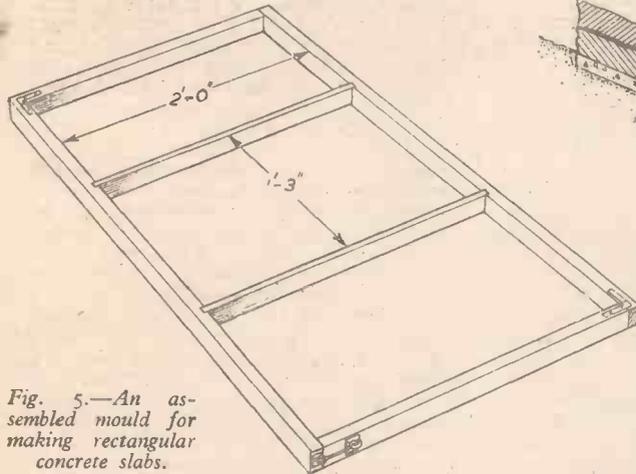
An assembled mould for making rectangular concrete slabs.
